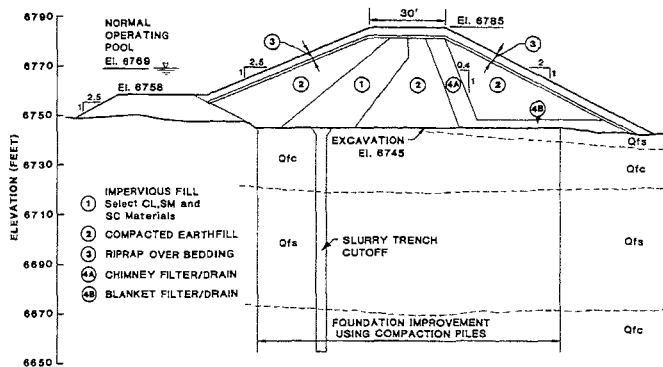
JACKSON LAKE DAM, WYOMING—TYPICAL SECTION OF EARTHFILL DAM WITH FOUNDATION IMPROVEMENTS
